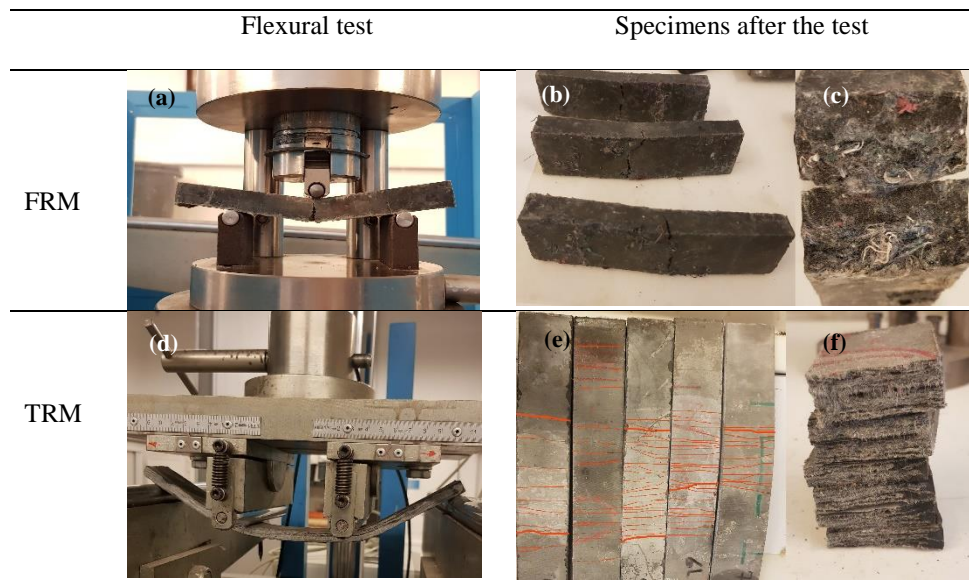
Flexural tests setup: (a) FRM three-point bending test; (b) cracks of FRM specimens; (c) cross-section of FRM specimens; (d) TRM four-point bending test; (e) cracks of TRM specimens; and (f) cross-section of TRM specimens.
